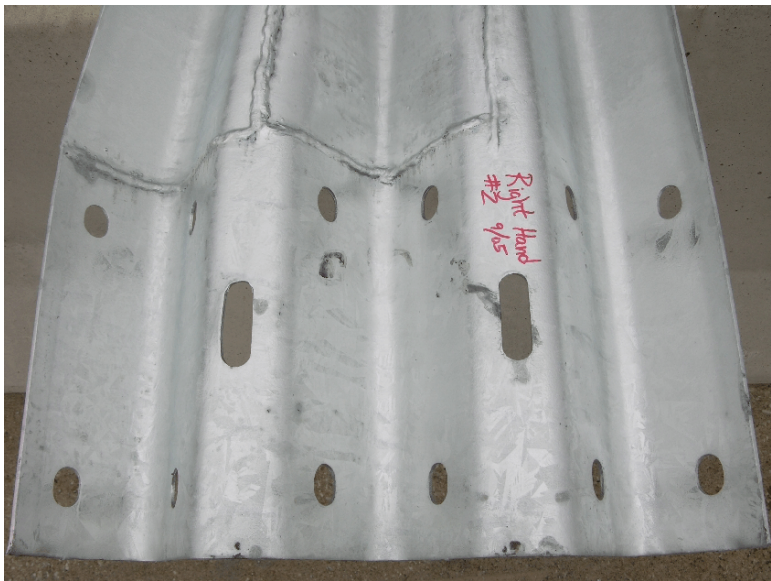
Welded W-beam to Thrie Beam Transition Element, Design No. 3
